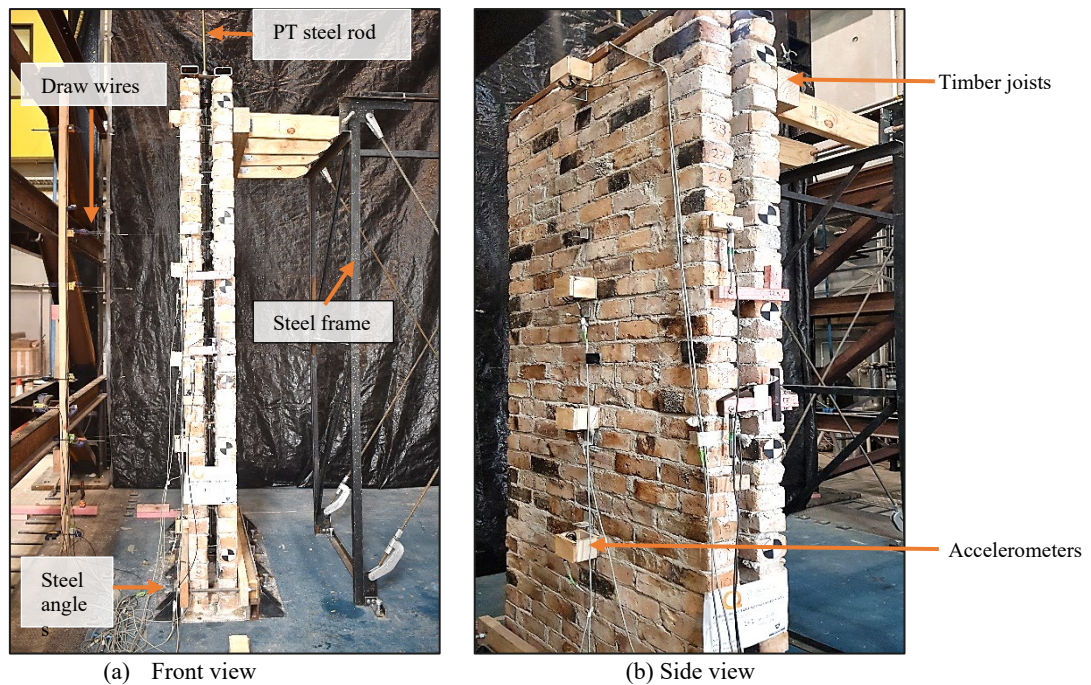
Test wall set-up of shaking table test showing 1+1 arrangement
